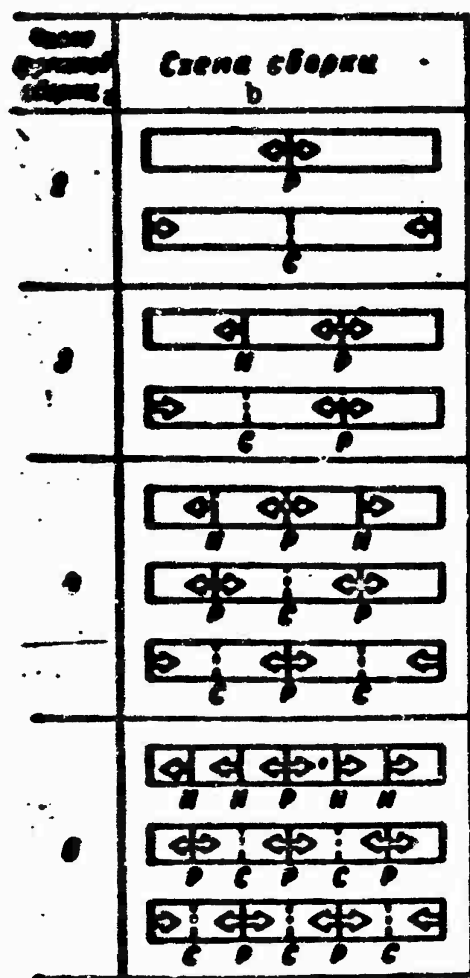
Schemes for multi-section assembly of a pavement. P) is a diverging section; C) is a converging section; H) is a running in section; a) number of assembly sections; b) assembly scheme.
